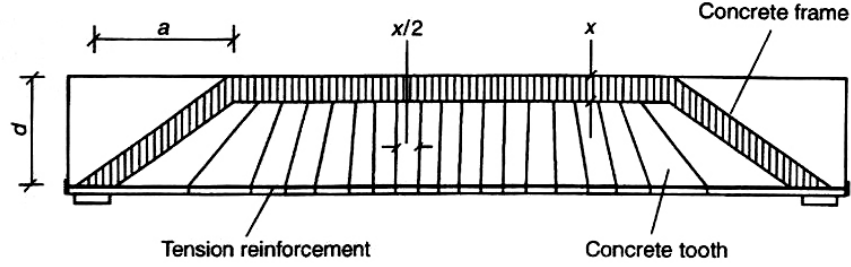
Concrete beam model used by CFP method for concrete shear capacity [51]
